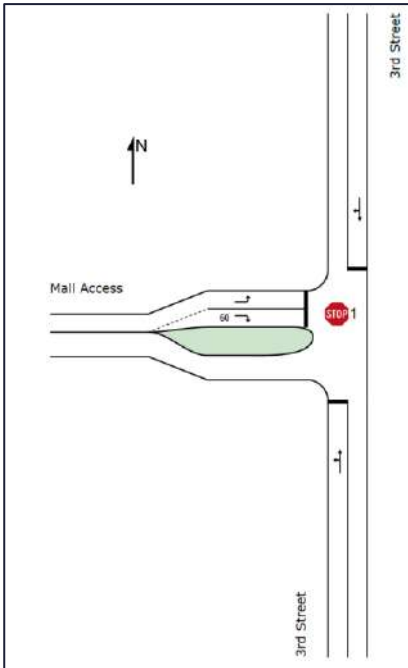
Existing Intersection Layout: 3rd Street and Goerge Square Access
